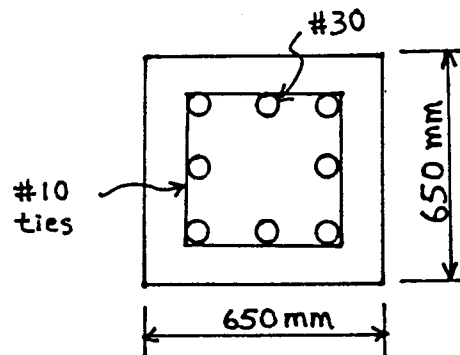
Column section for example 1 specifying #30 bars
